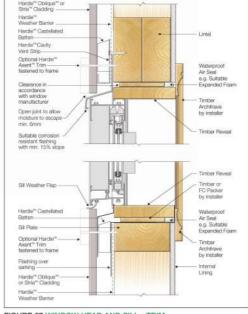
WINDOW HEAD AND SILL - TRIM
